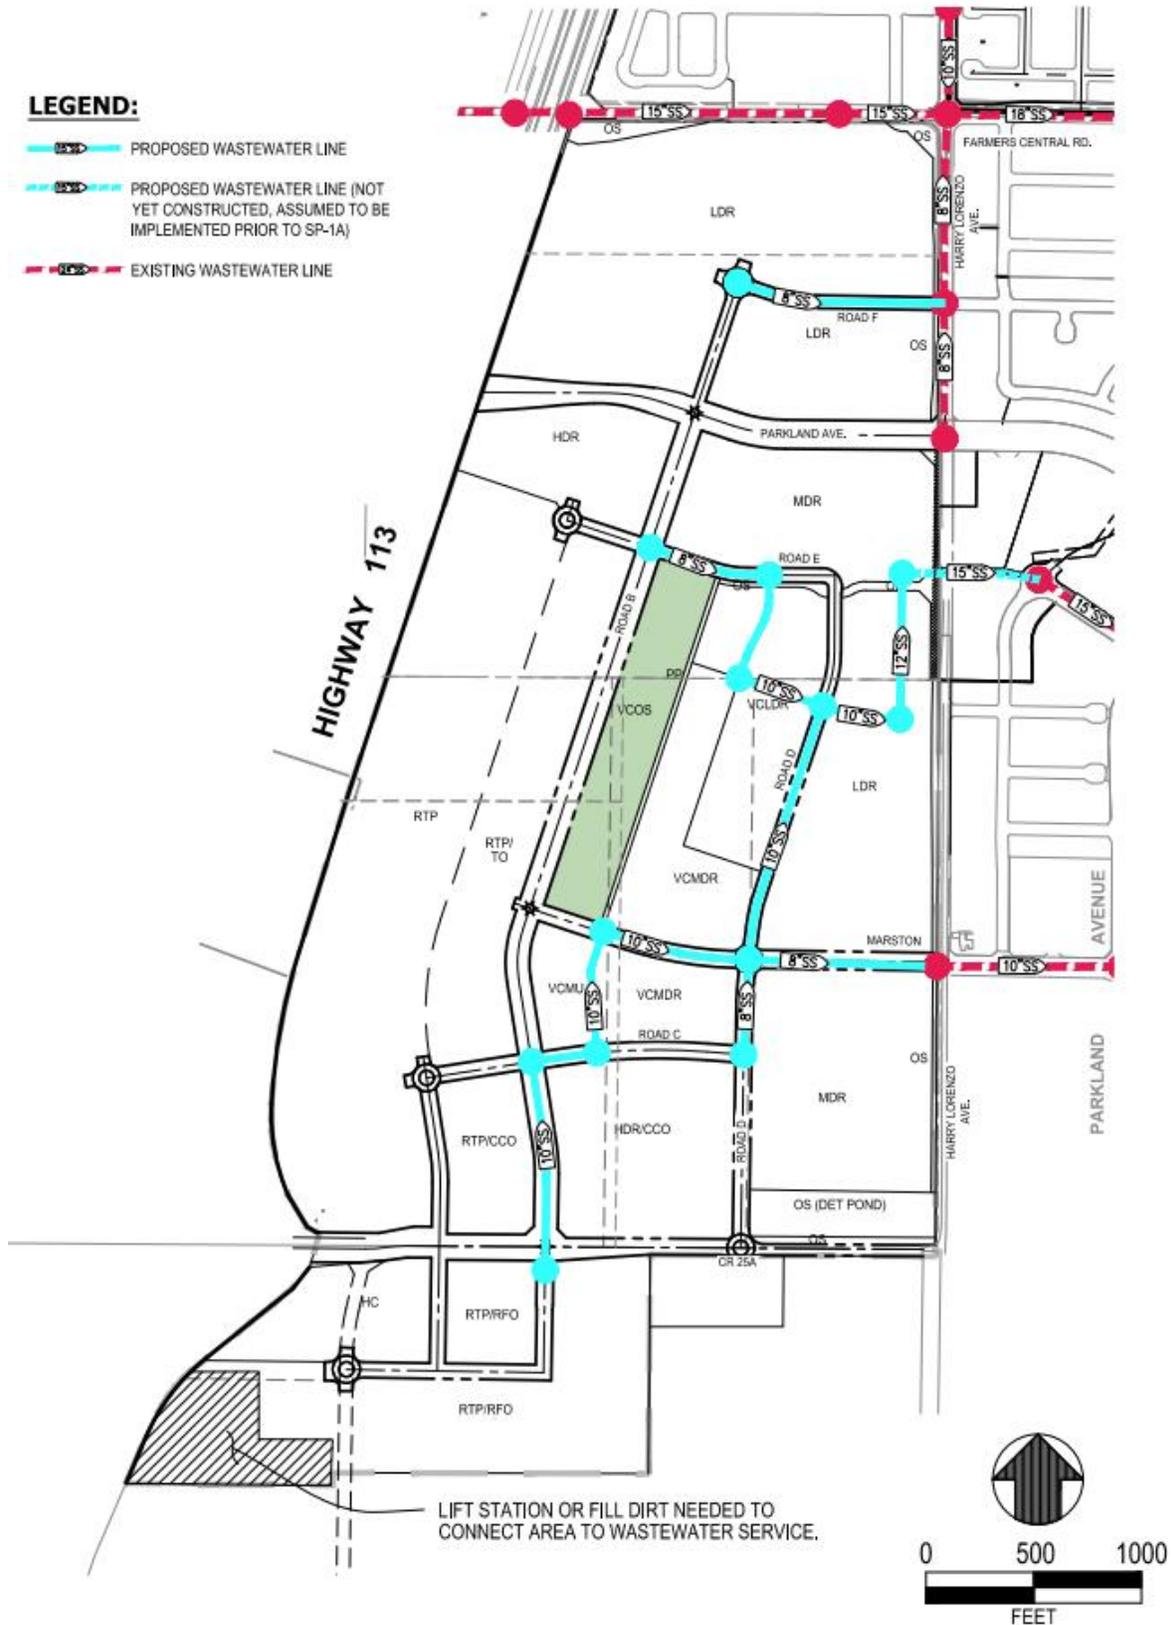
PROPOSED WASTEWATER SYSTEM
